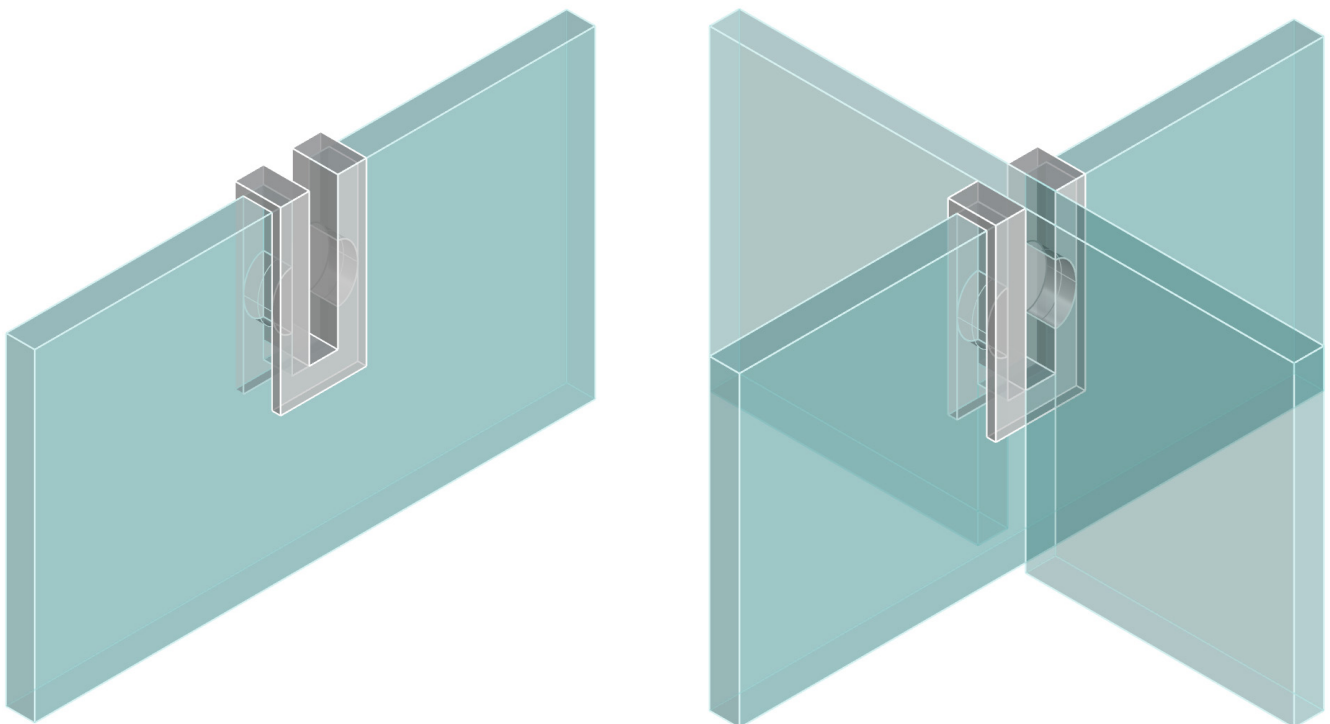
& 31, Slot joint connection design using Acrylic sheet with an embedded steel plate at bottom , Source: Author's own
